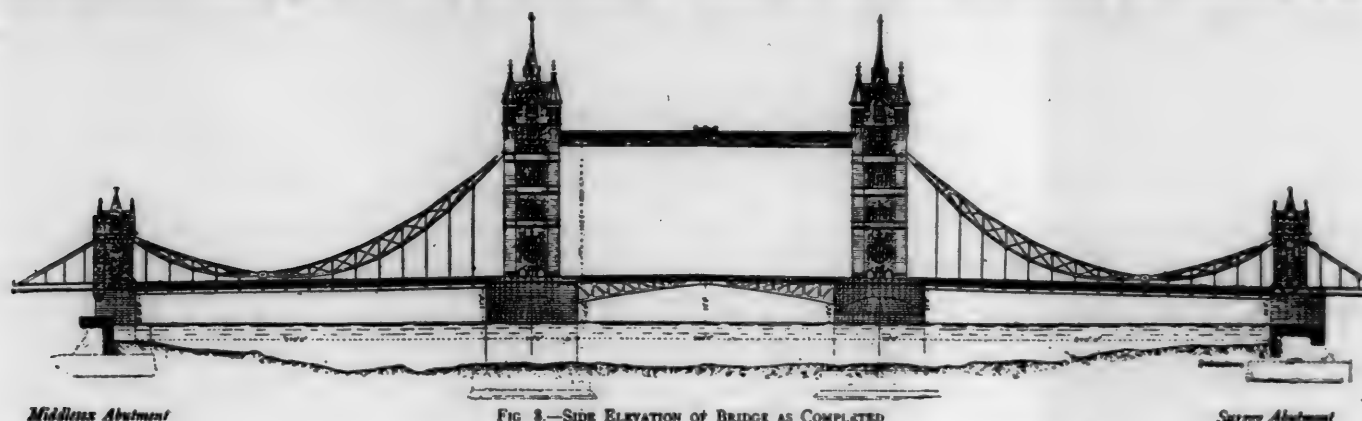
SIDE ELEVATION OF BRIDGE AS COMPLETED
